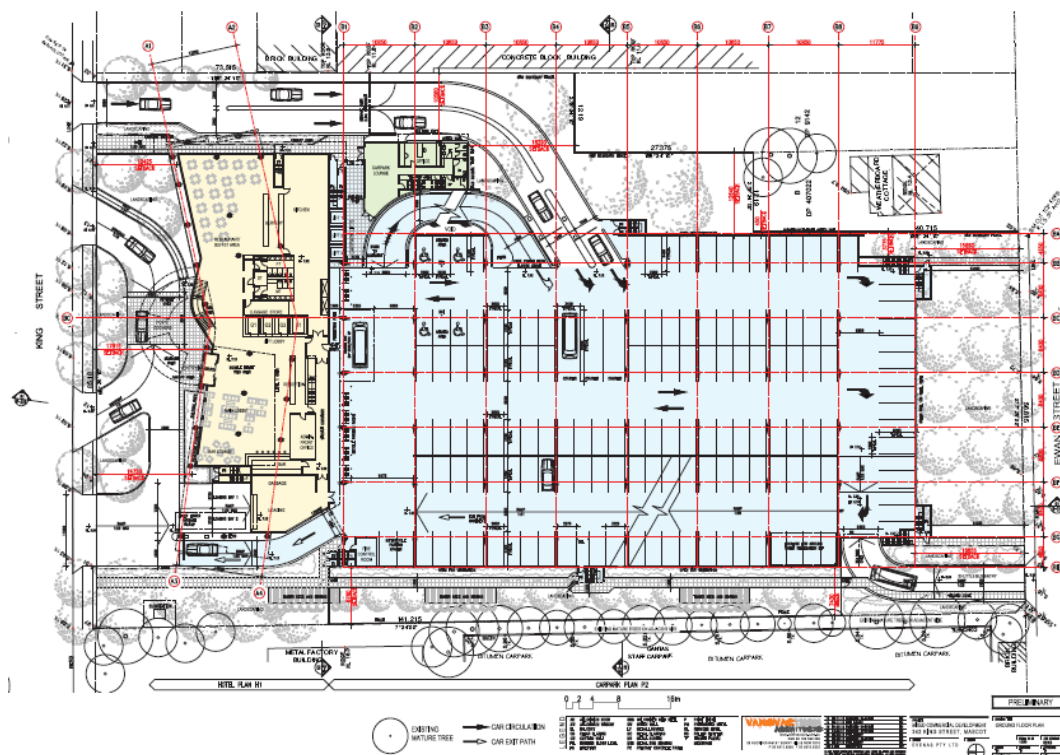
Ground Floor Plan of proposed hotel and carpark.
